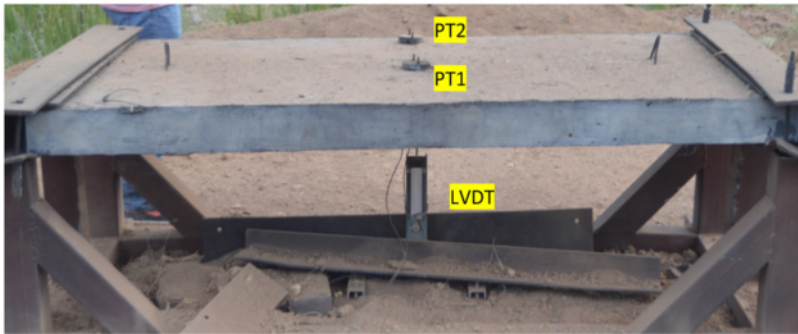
Pressure sensor installation on the UHMWPE-1 slab under 6 kg TNT at 1.5 m standoff distance.
